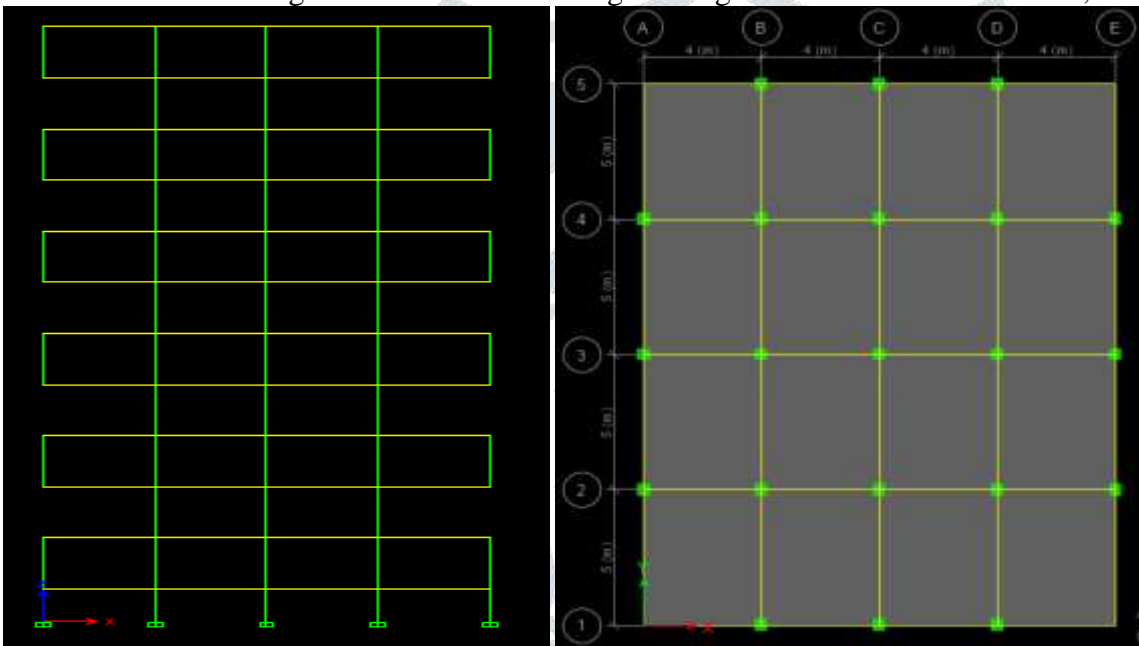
G+5 Floating column structure having floating column at Edges at G+1, G+3, G+5
